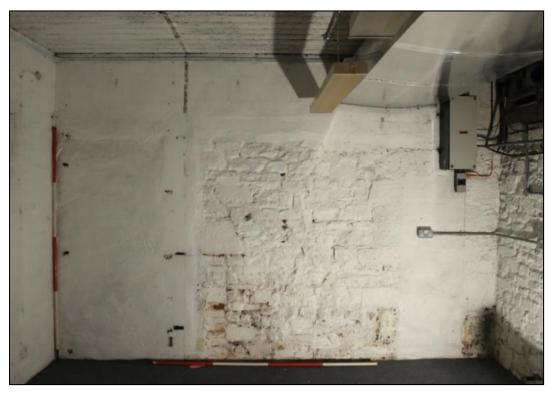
View north, showing the north wall of the small strongroom, with inserted doorway on the right. 2m scales.
